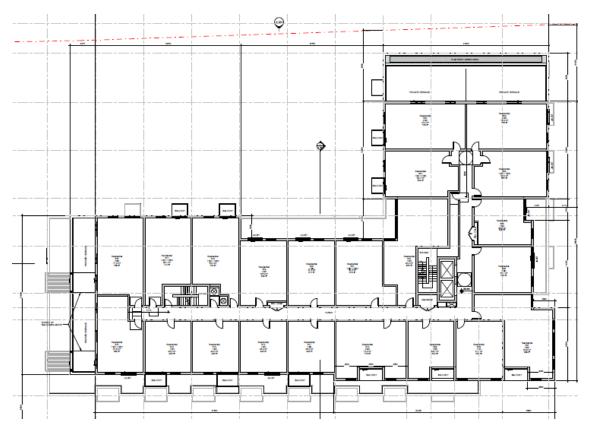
Sixth and Seventh Floor Layouts, Superkul Architects
